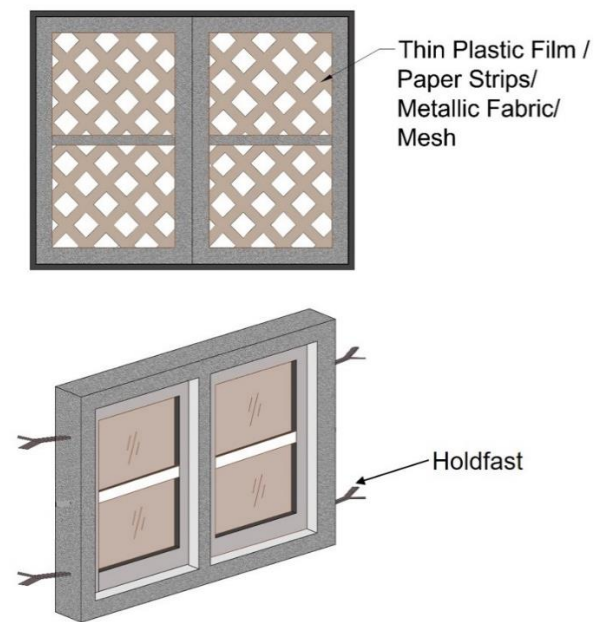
(B) PROTECTION OF GLASS PANELING AND ADEQUATE ANCHORAGE OF ALUMINUM/MILD STEEL SECTIONS OF DOOR AND WINDOW FRAMES WITH HOLDFASTS
